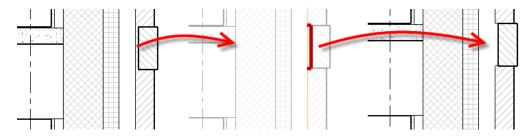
Modifying the brick at the soldier course using the Cut Profile tool.
